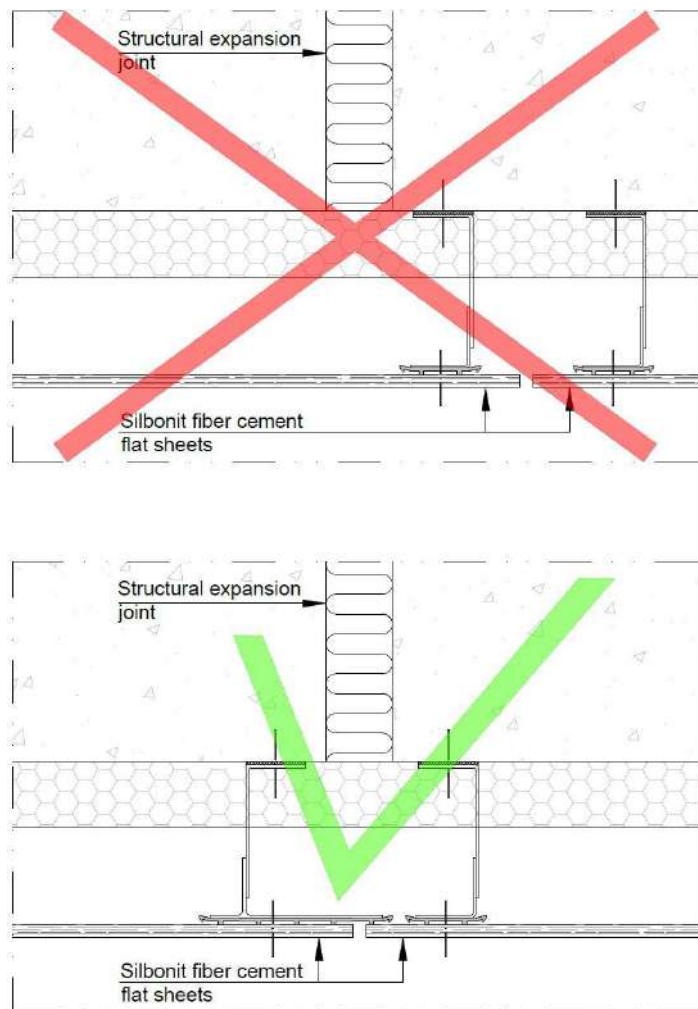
Horizontal sections – Examples of incorrect and correct arrangement of profiles and cladding panels along an expansion joint of the supporting structure
